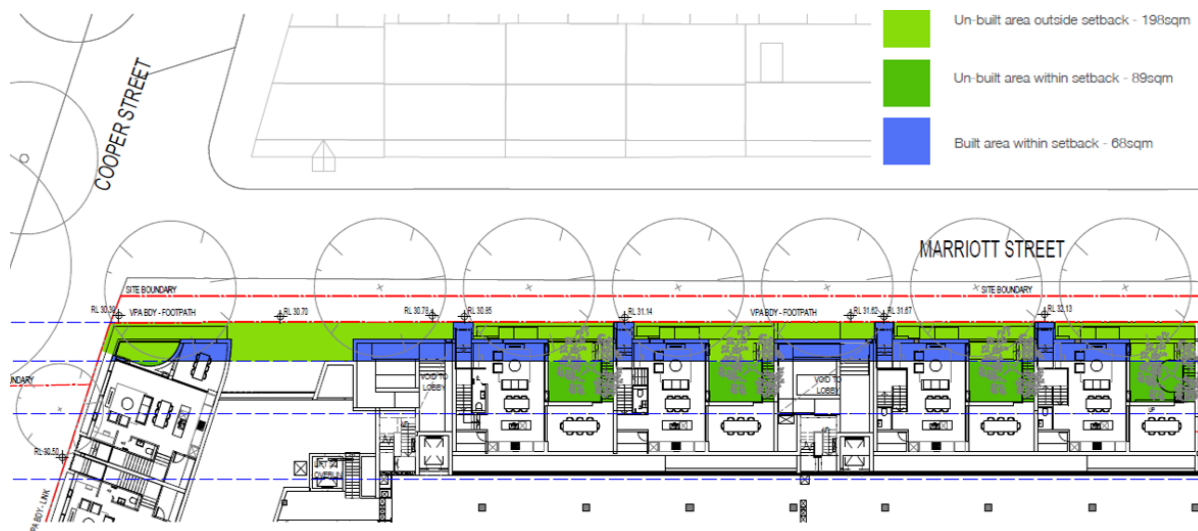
Proposed lower ground floor plan depicting the 3 metre required setback to Marriott Street, with built and unbuilt areas highlighted.
